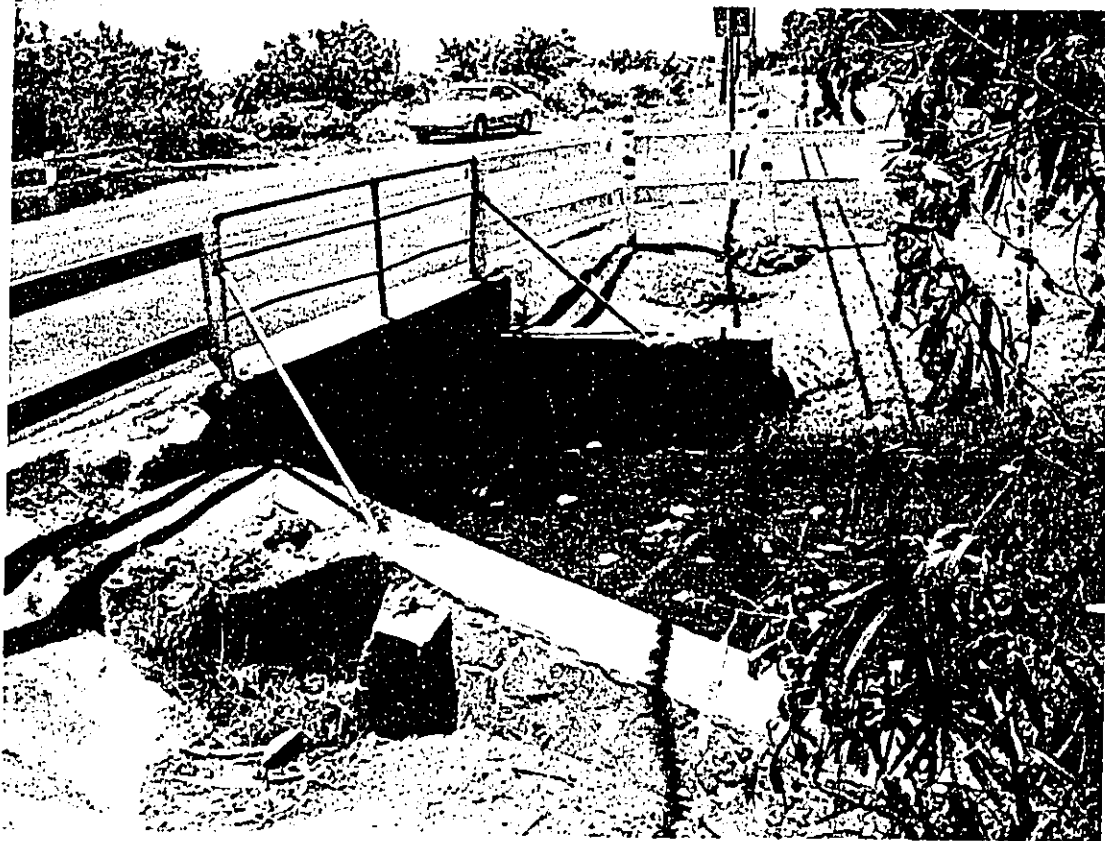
Downstream side of existing box culvert from north side of Waialua Beach Road.
